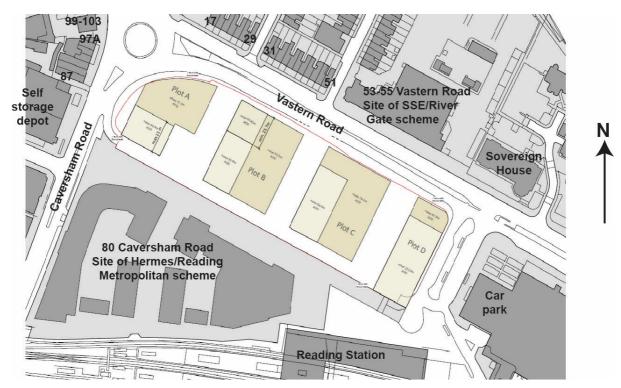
Maximum parameter plan (CD 1.34.10.4) by Collado Collins showing the development in light brown, and annotated to show surrounding buildings. North is at the top of the plan.
